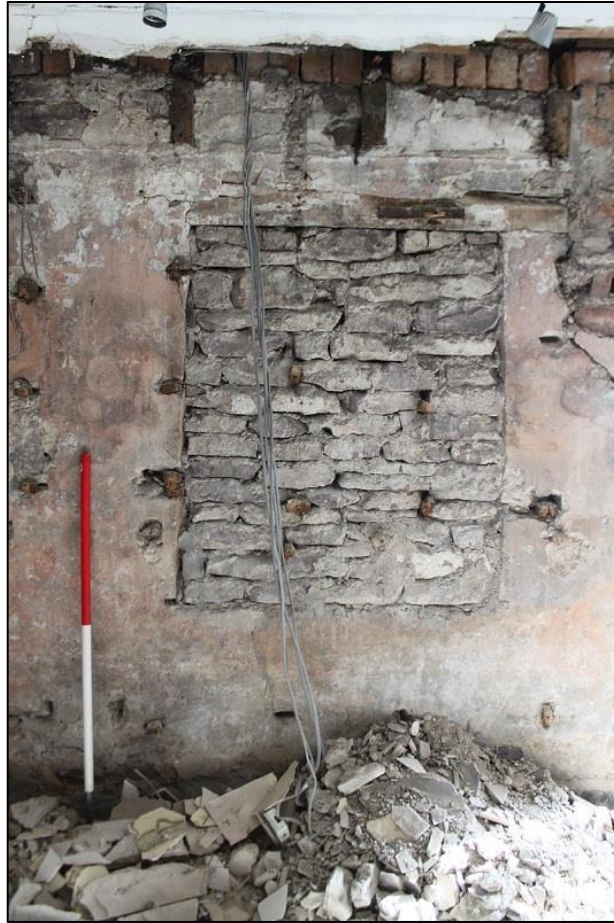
Room q, blocked window and raised wallhead, NW end NE Wall
